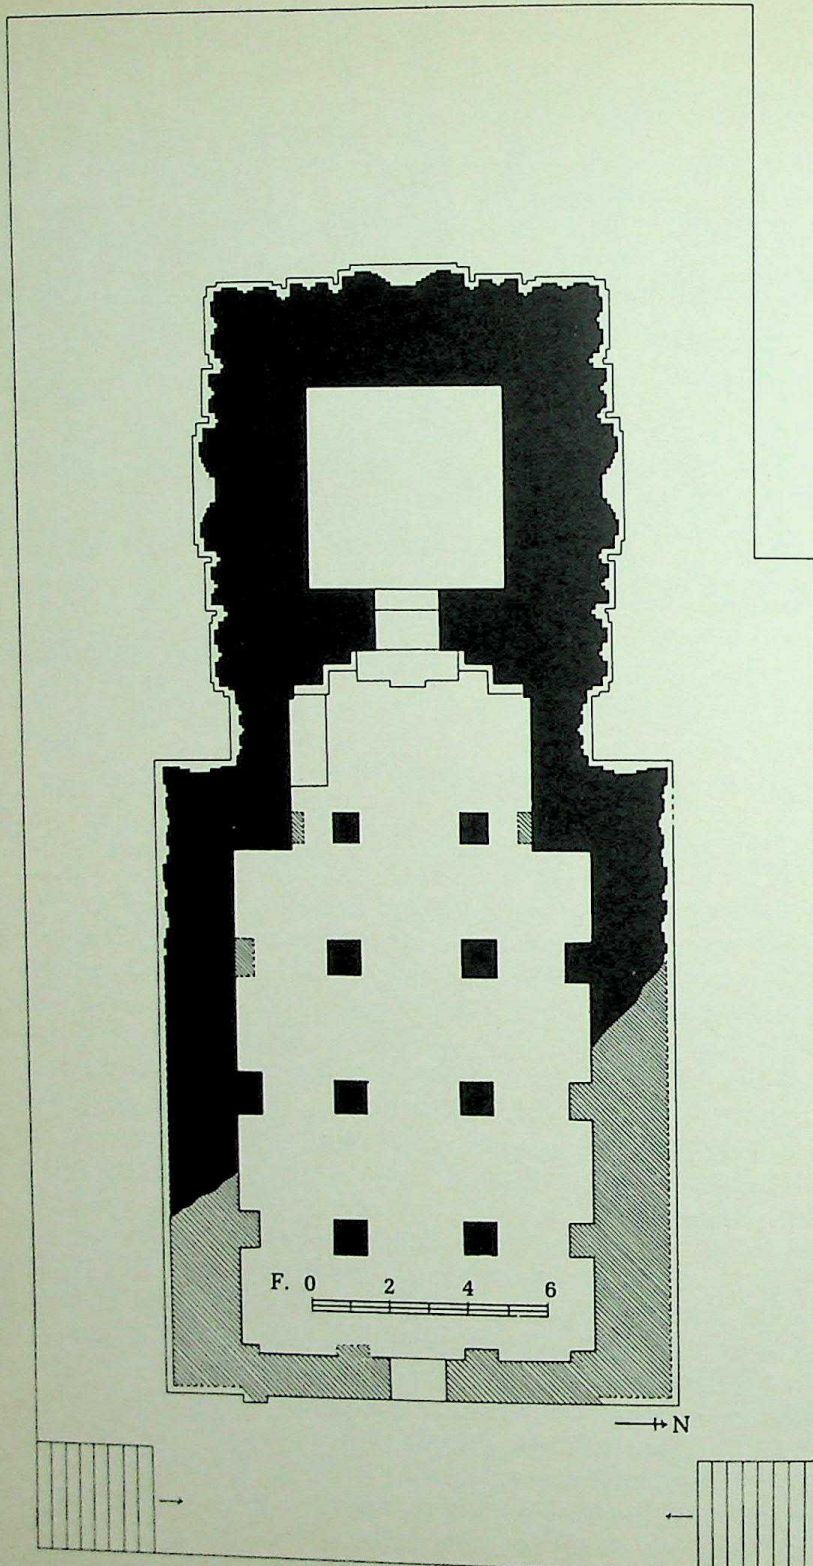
Sirpur. Lakṣmaṇa temple, plan.
